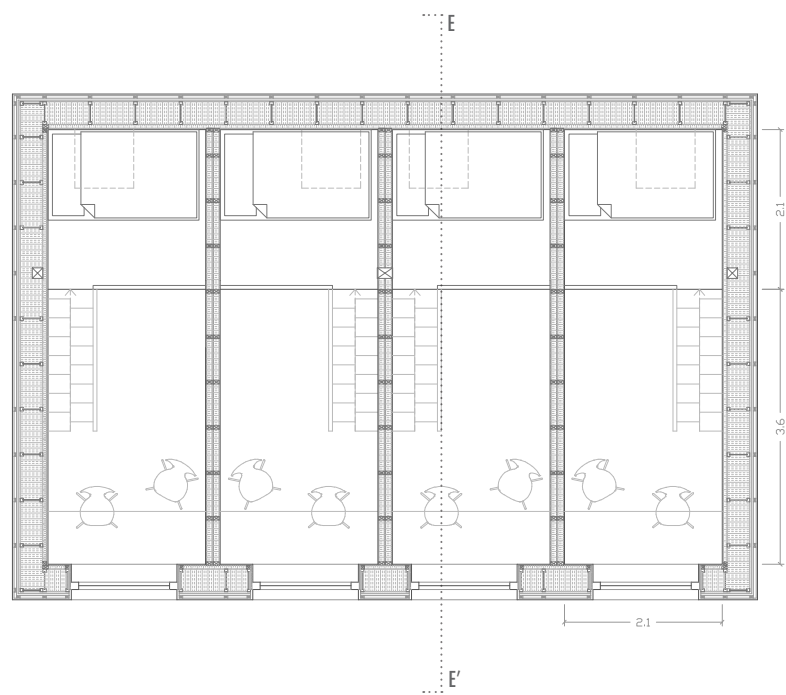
FLOOR PLANS OF THE THREE-STOREY BUILDING, SCALE 1:100
